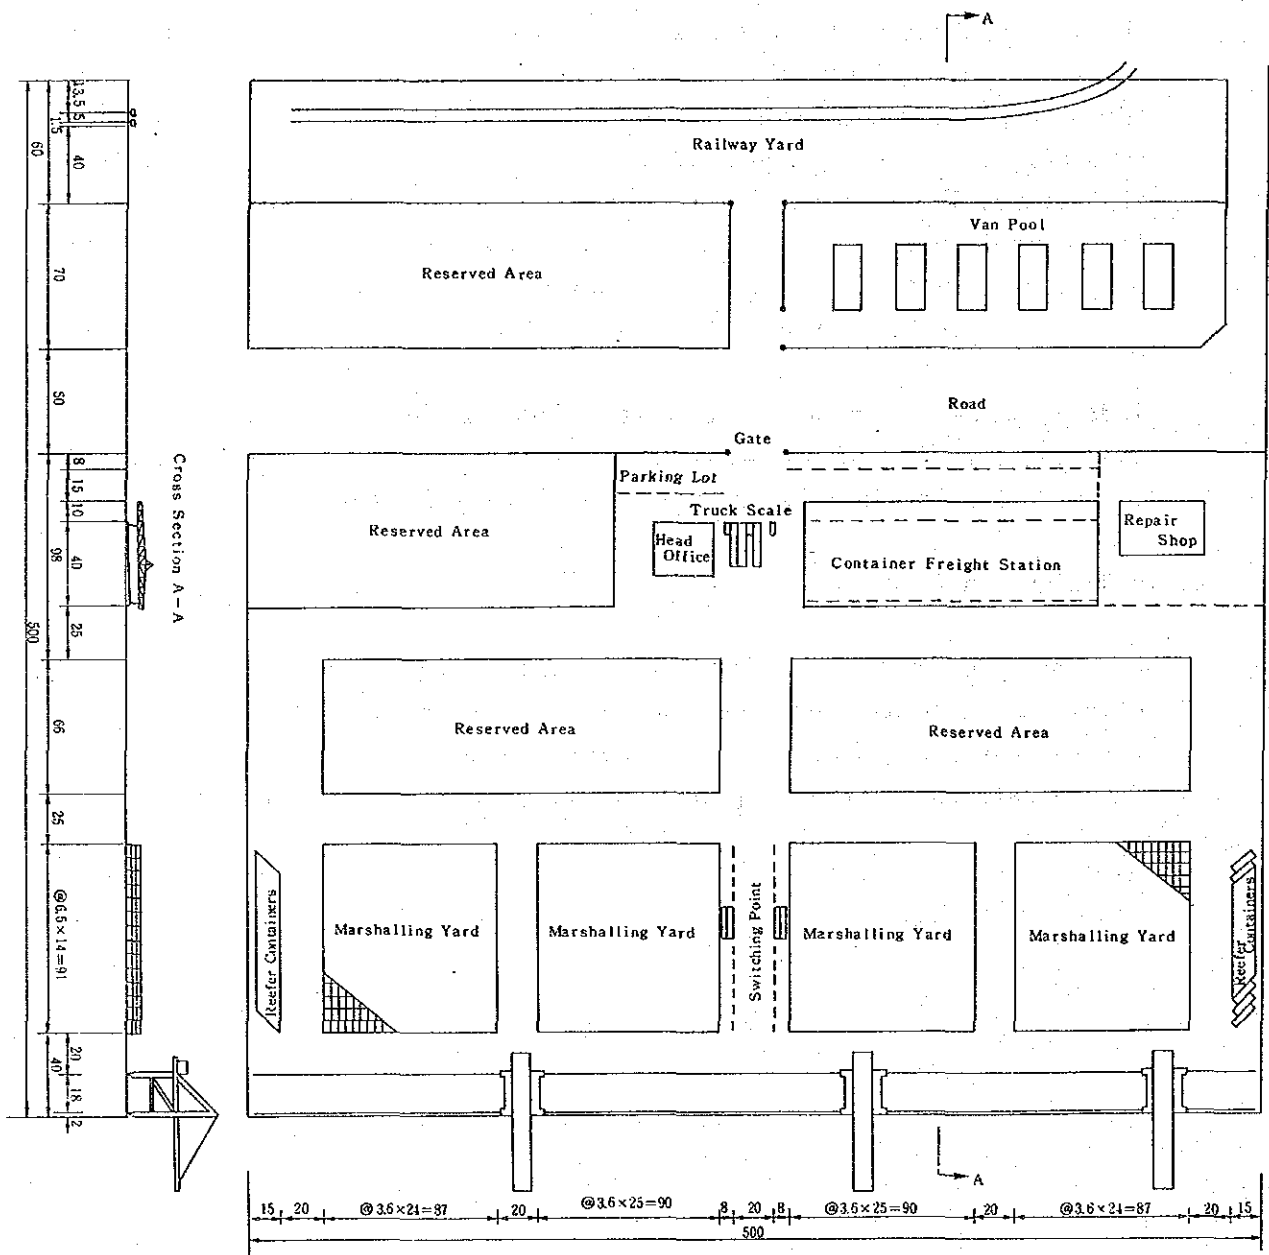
Layout Plan of the Facilities of the Container Terminal
